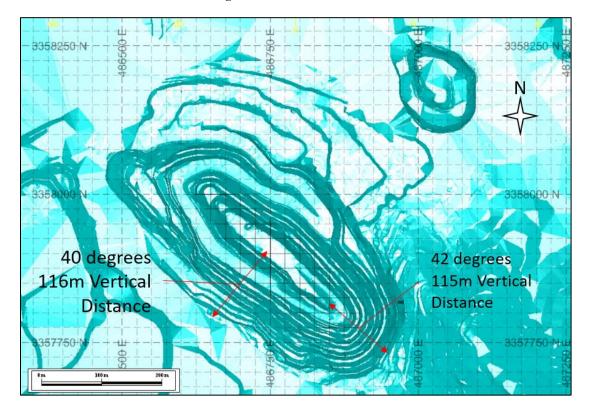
Pit Wall Angle Measurements: La Chicharra Pit
